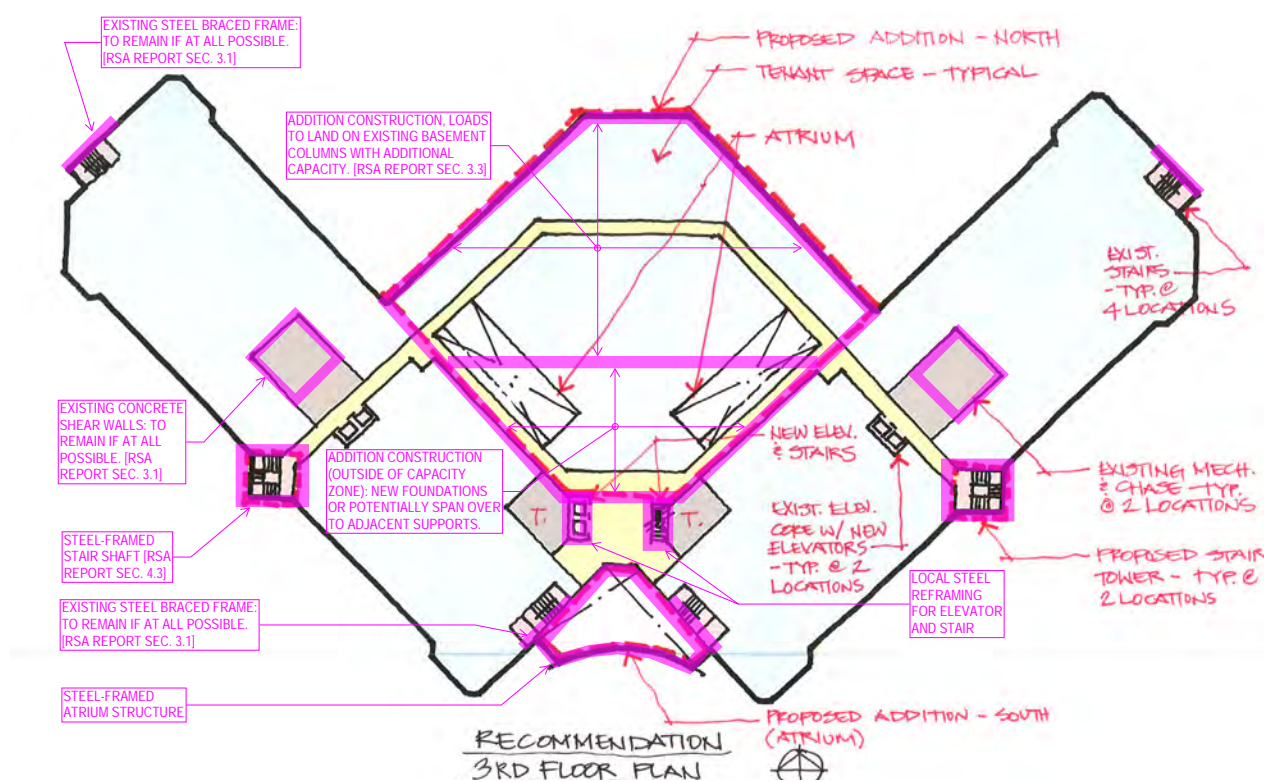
Recommendation Scheme Structural Markups – 3rd Floor Plan
